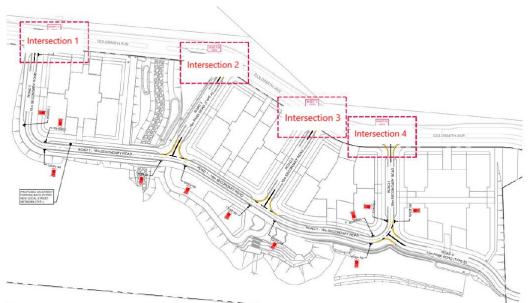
Proposed intersection layout (Source: Civil Engineering, Services & Infrastructure Master Planning Report)
